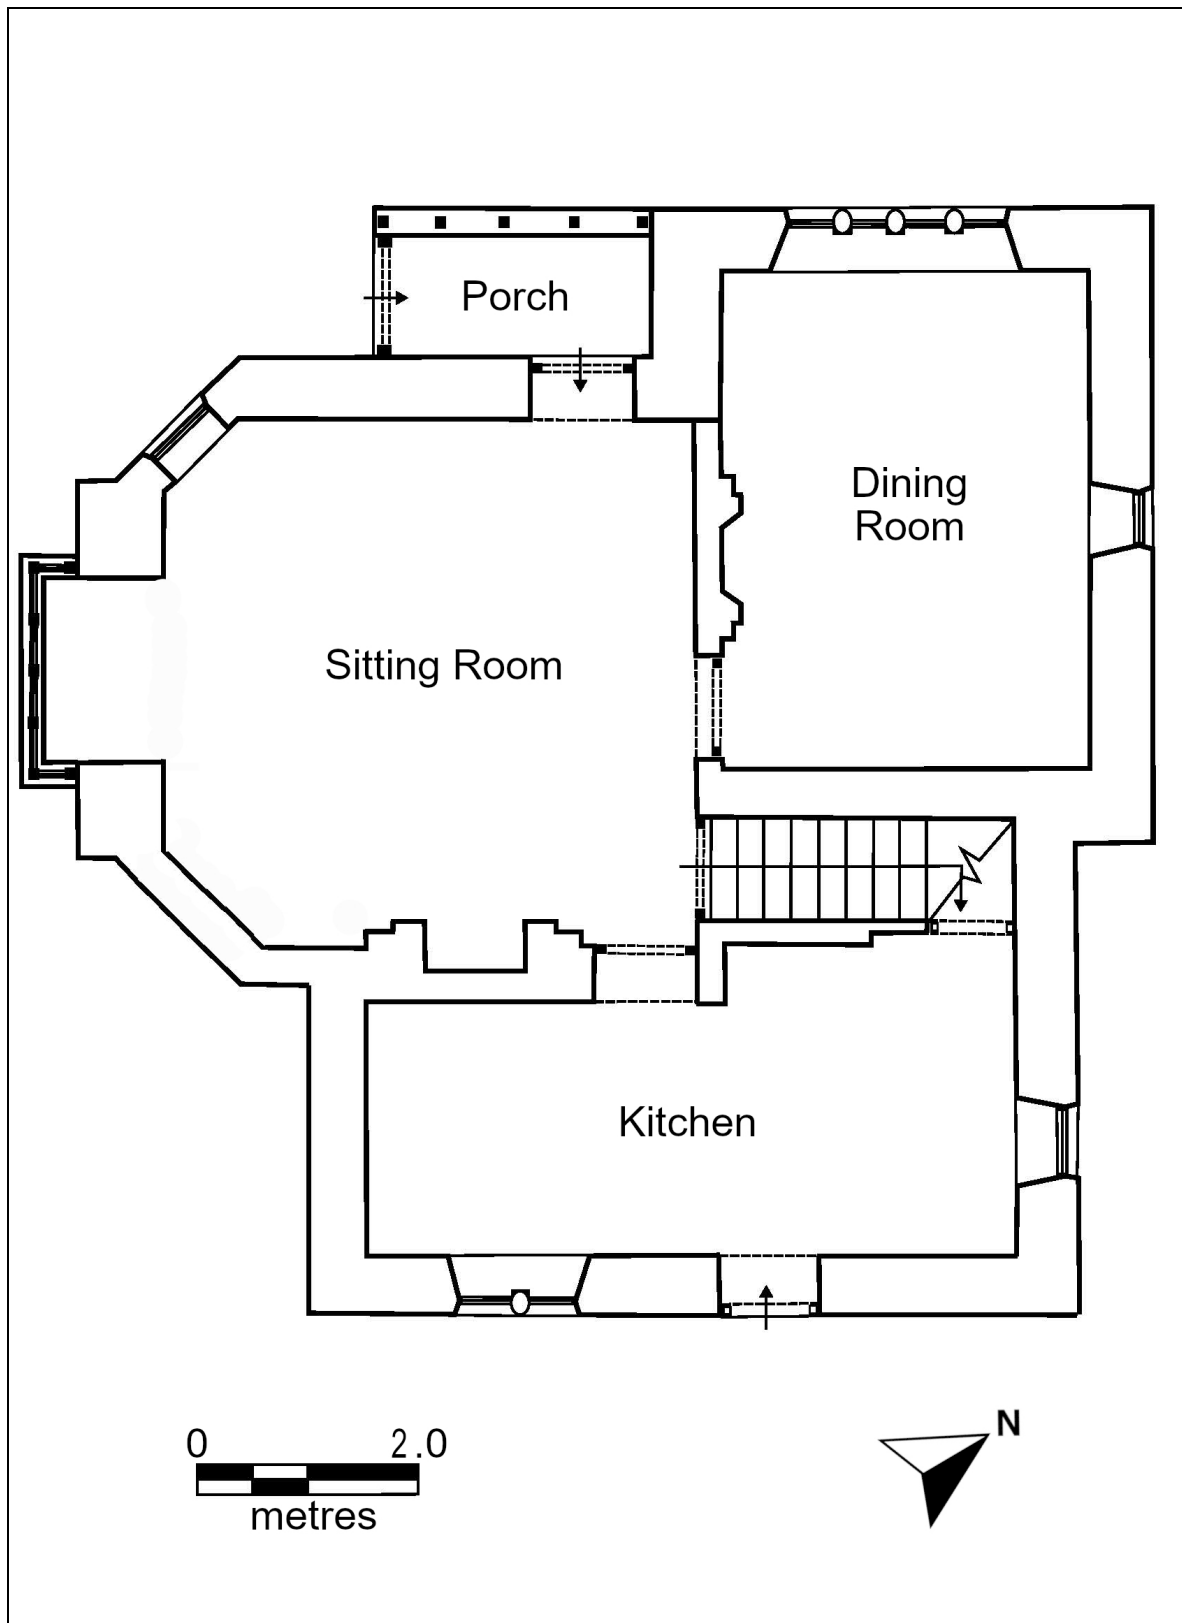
Ground floor plan of Ty Fry Lodge, drawn at 1:50
